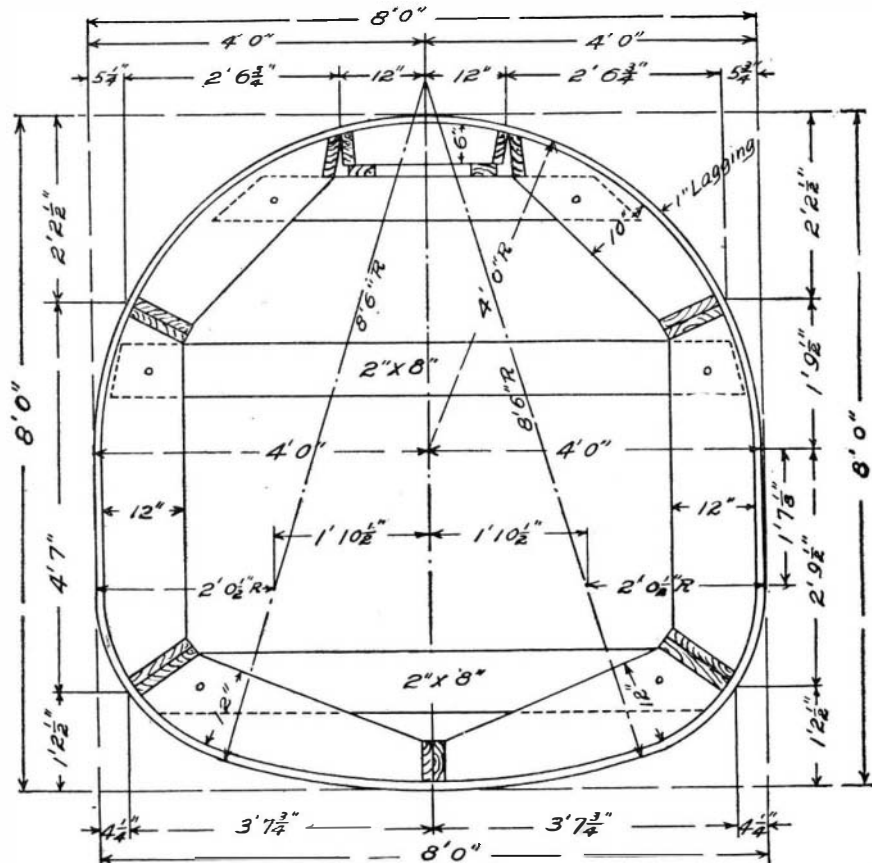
CENTER FOR 8 FOOT CONDUIT.
